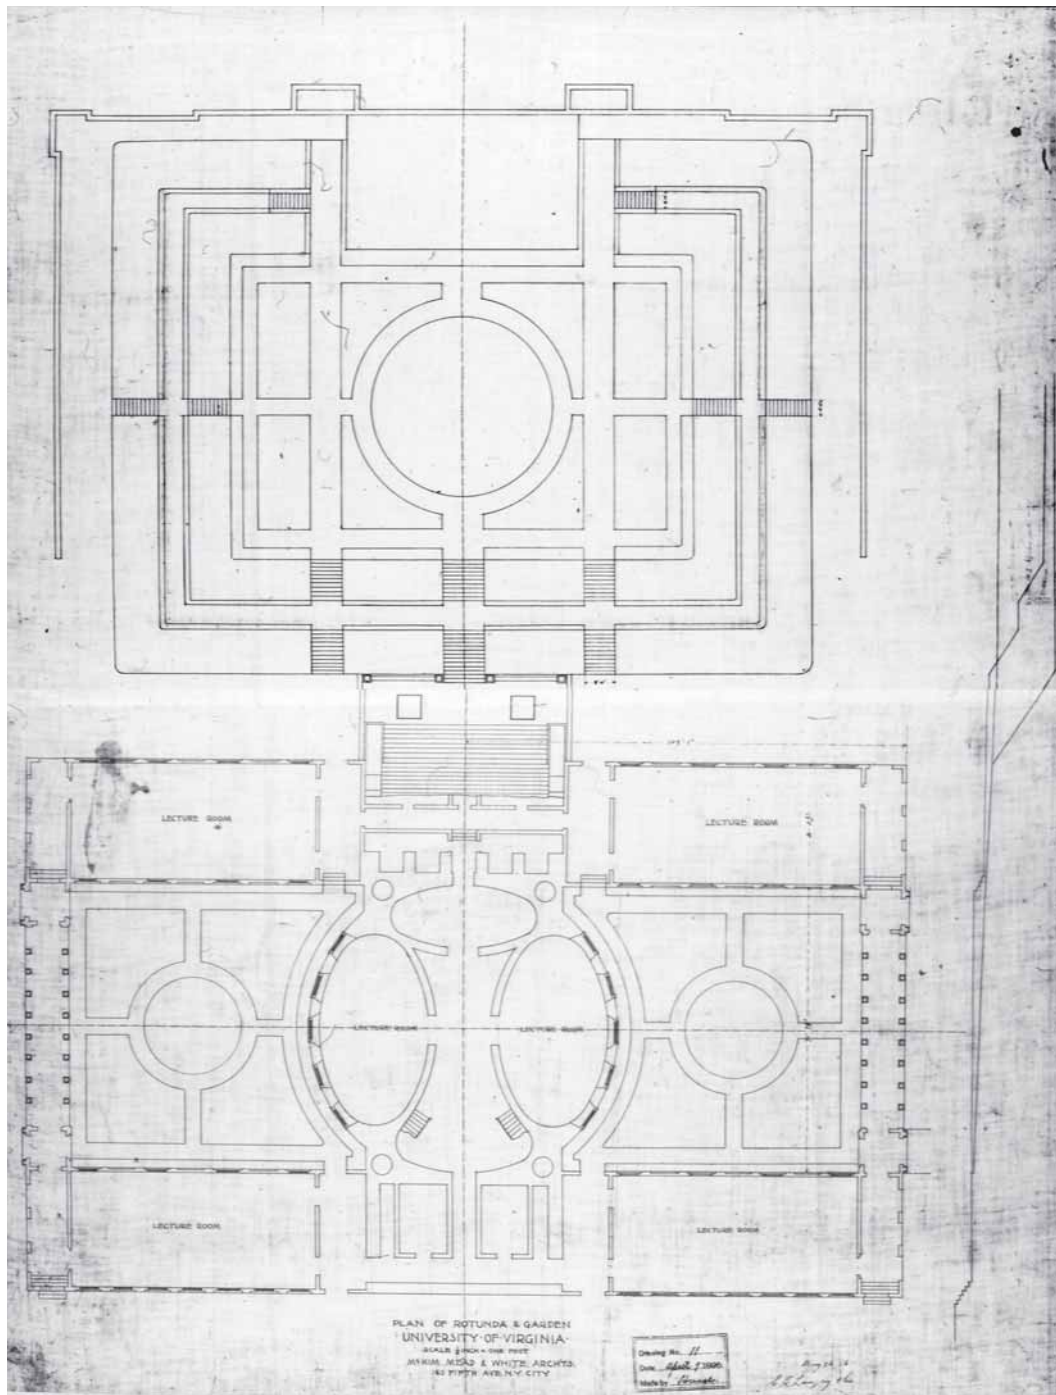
McKim Mead & White site plan for the Rotunda. [Special Collections, UVA]
